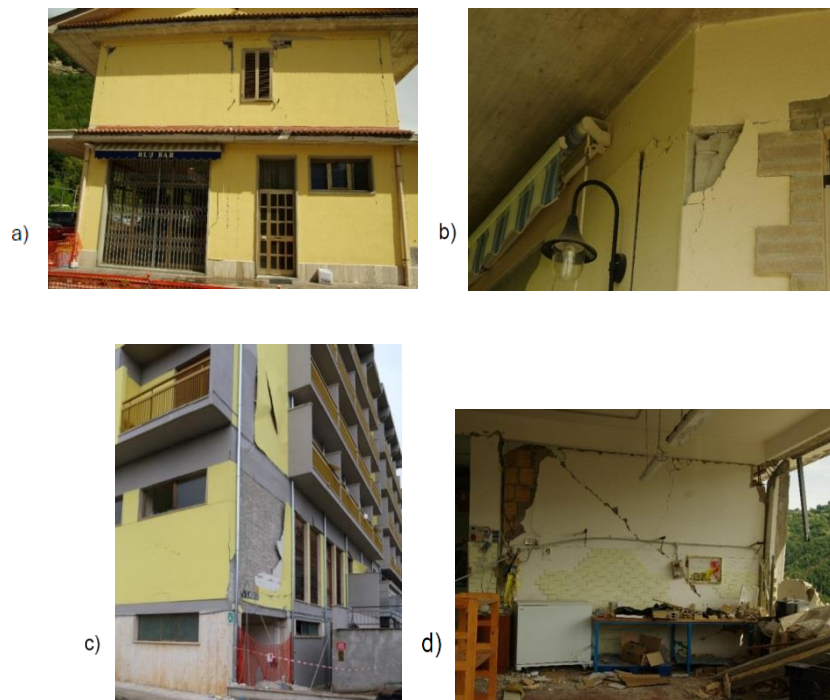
In plane failures of masonry infills of reinforced concrete buildings in Pescara del Tronto and Amatrice
